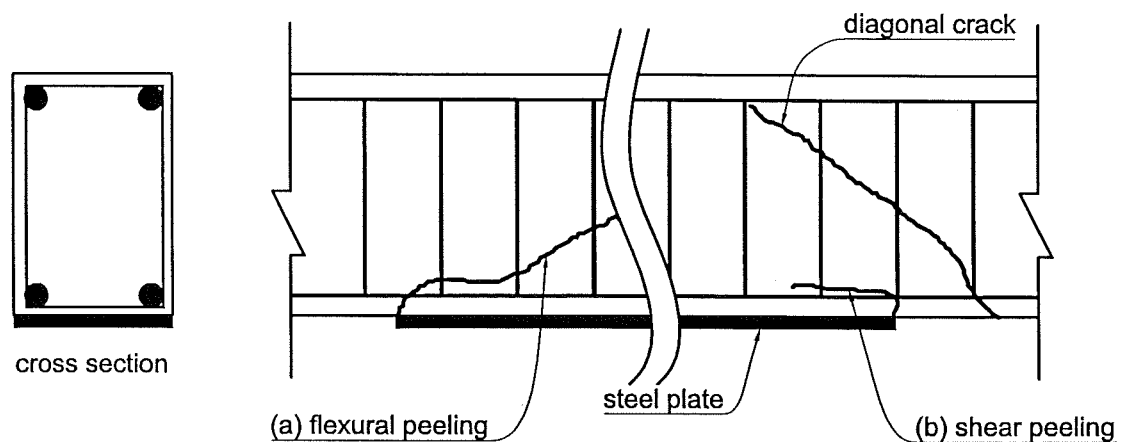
Failure Modes in a Steel-Plate-Bonded Beam [M6]
